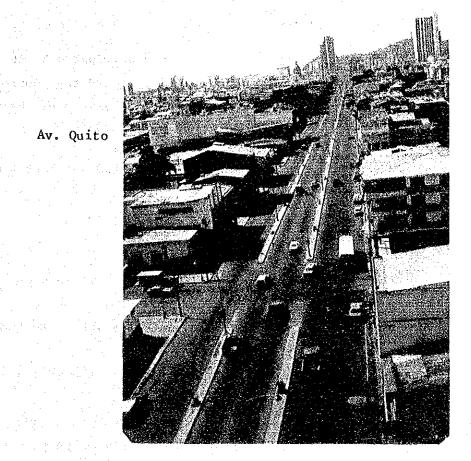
TYPICAL PRESENT CROSS - SECTION
